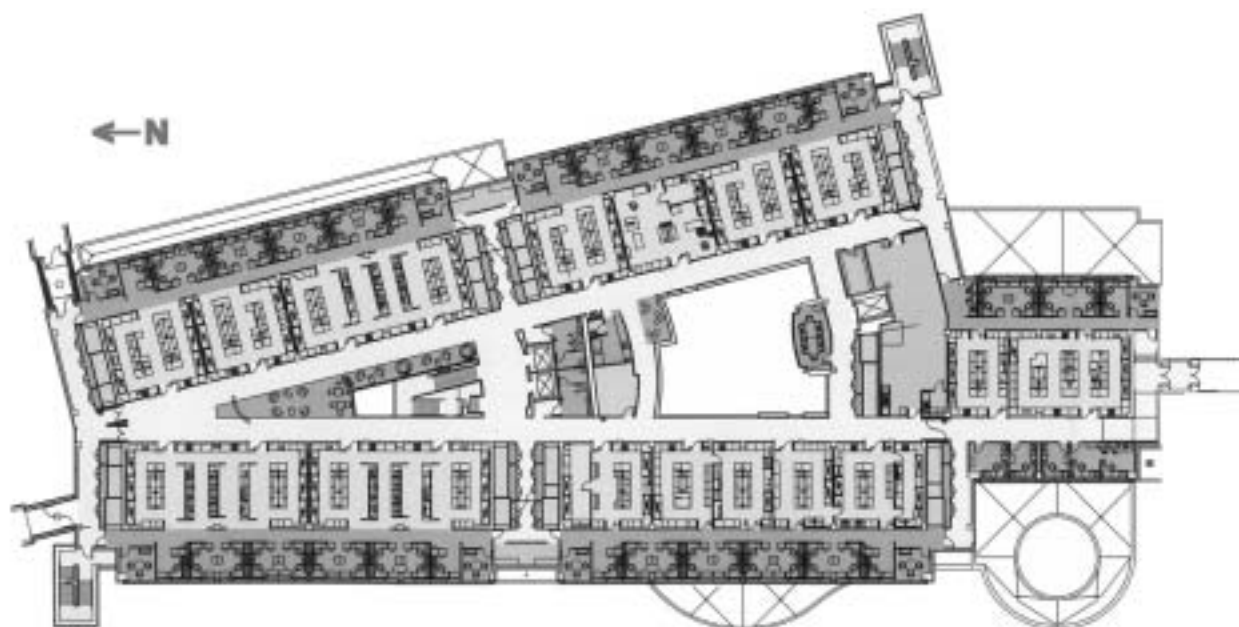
Floor plan of the building (Courtesy of Flad & Associates, Architect).
